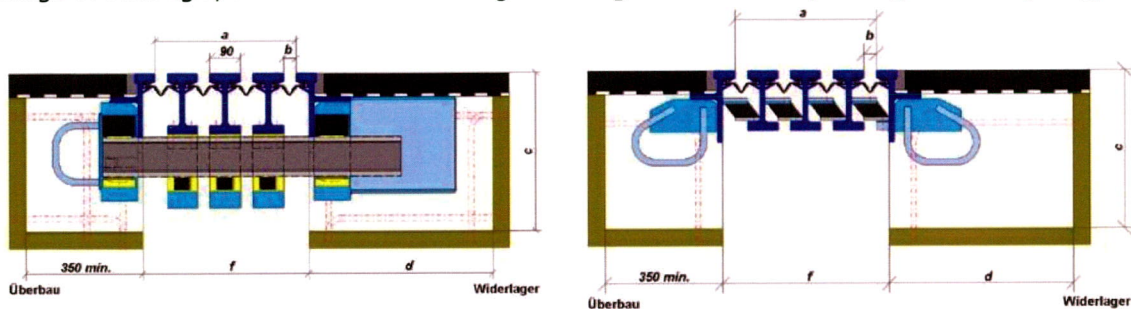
Left: Cross sectional view of a crossbeam of a WSG joint;
